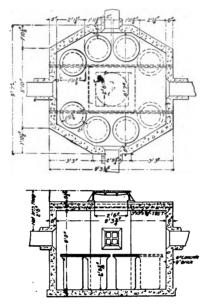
Vault Size 12, Used for Installing 6 to 8 Loading Pots on Conduit Runs when Intersected.
